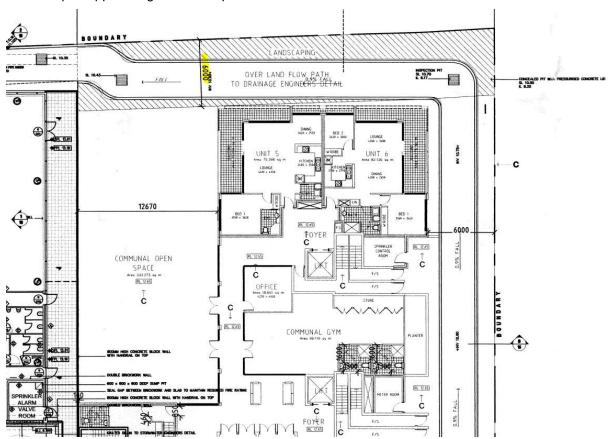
Partial floor plan of 27 Atchison Street showing 6m setback
